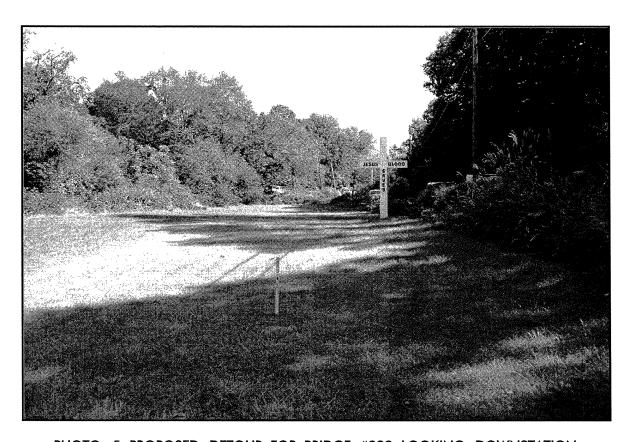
PROPOSED DETOUR FOR BRIDGE #222, LOOKING DOWNSTATION.
